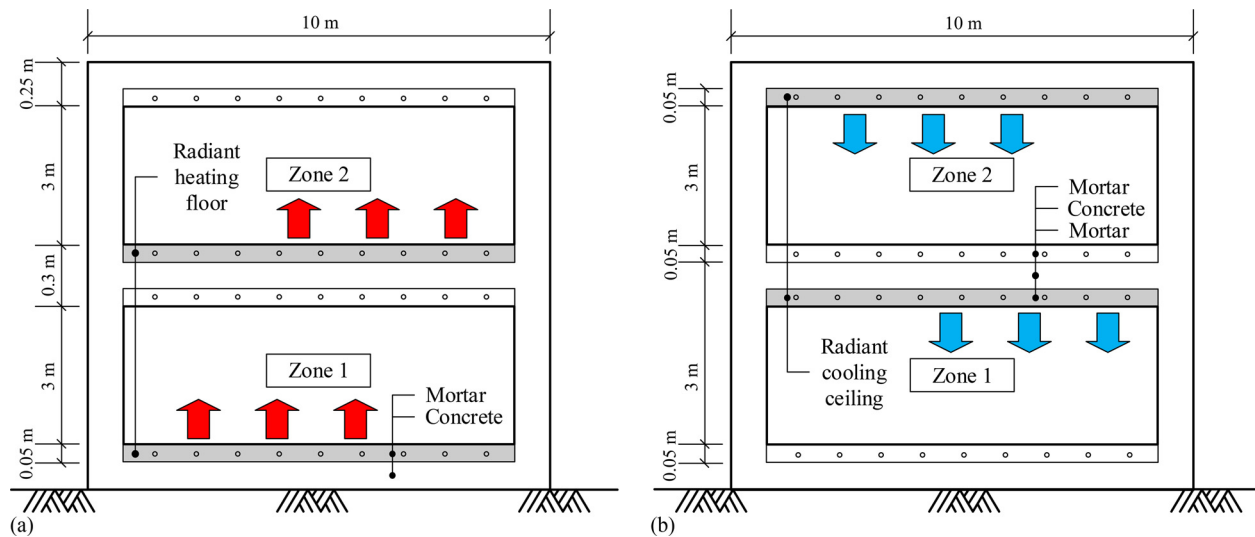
A section view of the building slab and exterior walls for two thermal zones used for the verification analysis: (a) radiant heating floor; (b) radiant cooling ceiling
